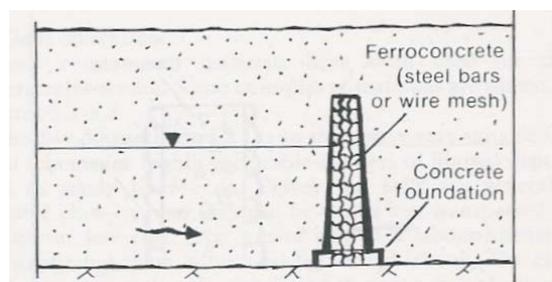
Reinforced concrete dam (Nilsson, 1988)
